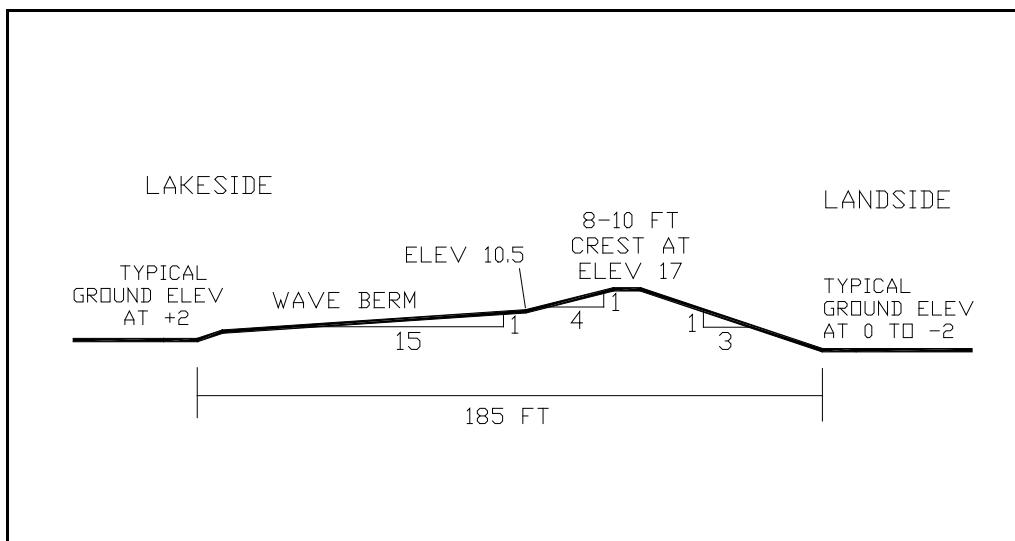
Typical levee cross section on Sacramento-San Joaquin River Delta.
